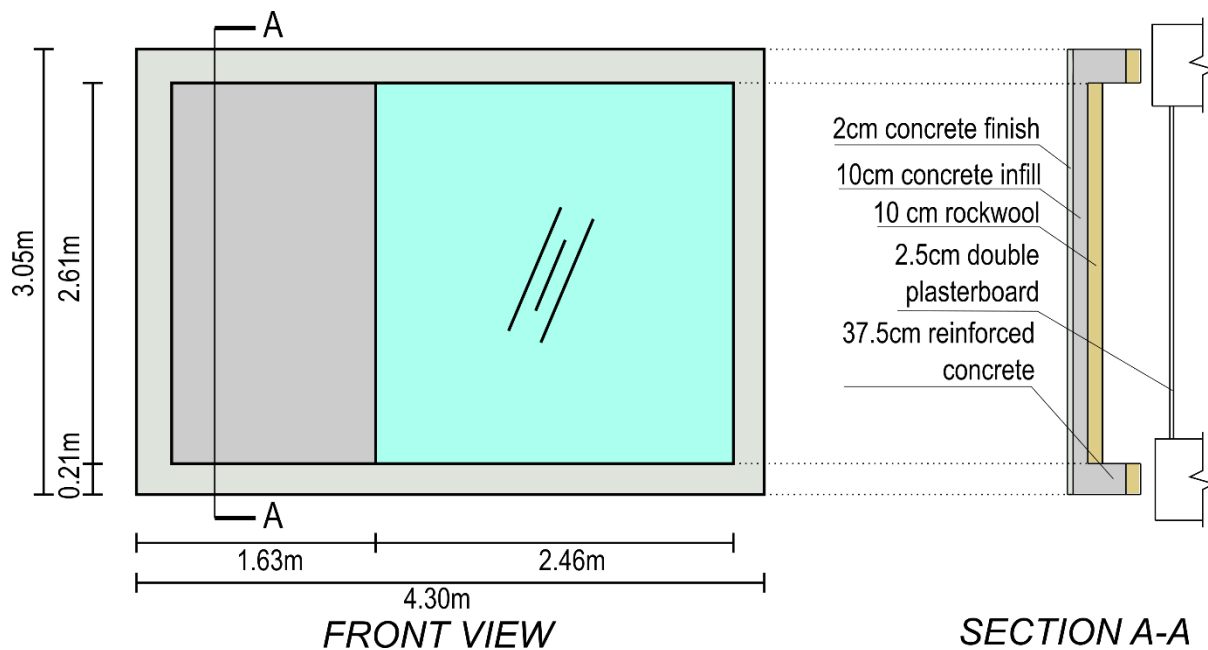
Main frontal dimensions (left) and build-up (right) of the investigated panel
